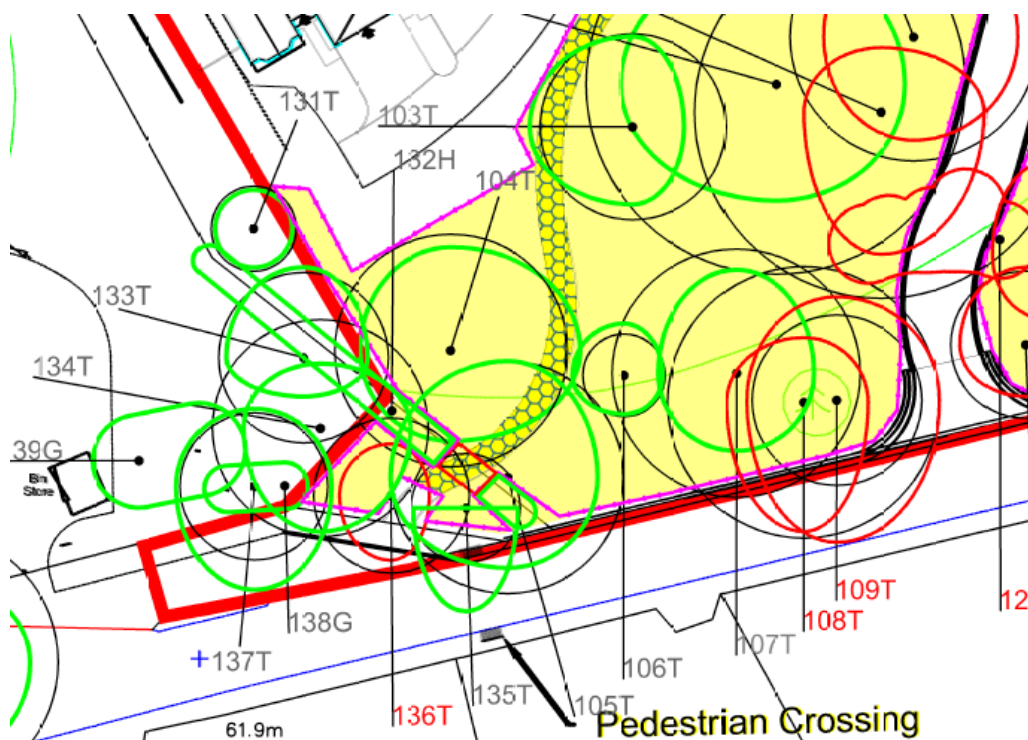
Tree Protection Plan. Trevor Bridge Associates Landscape Architects
